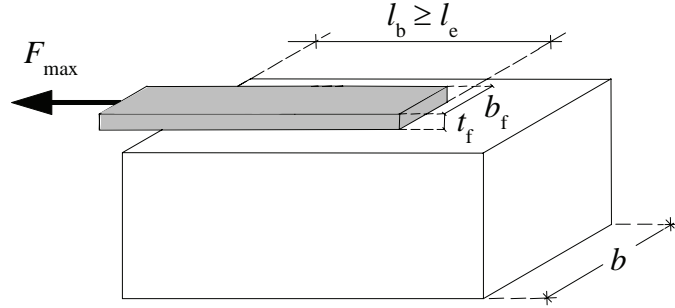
Maximum force allowed to FRP reinforcement.
